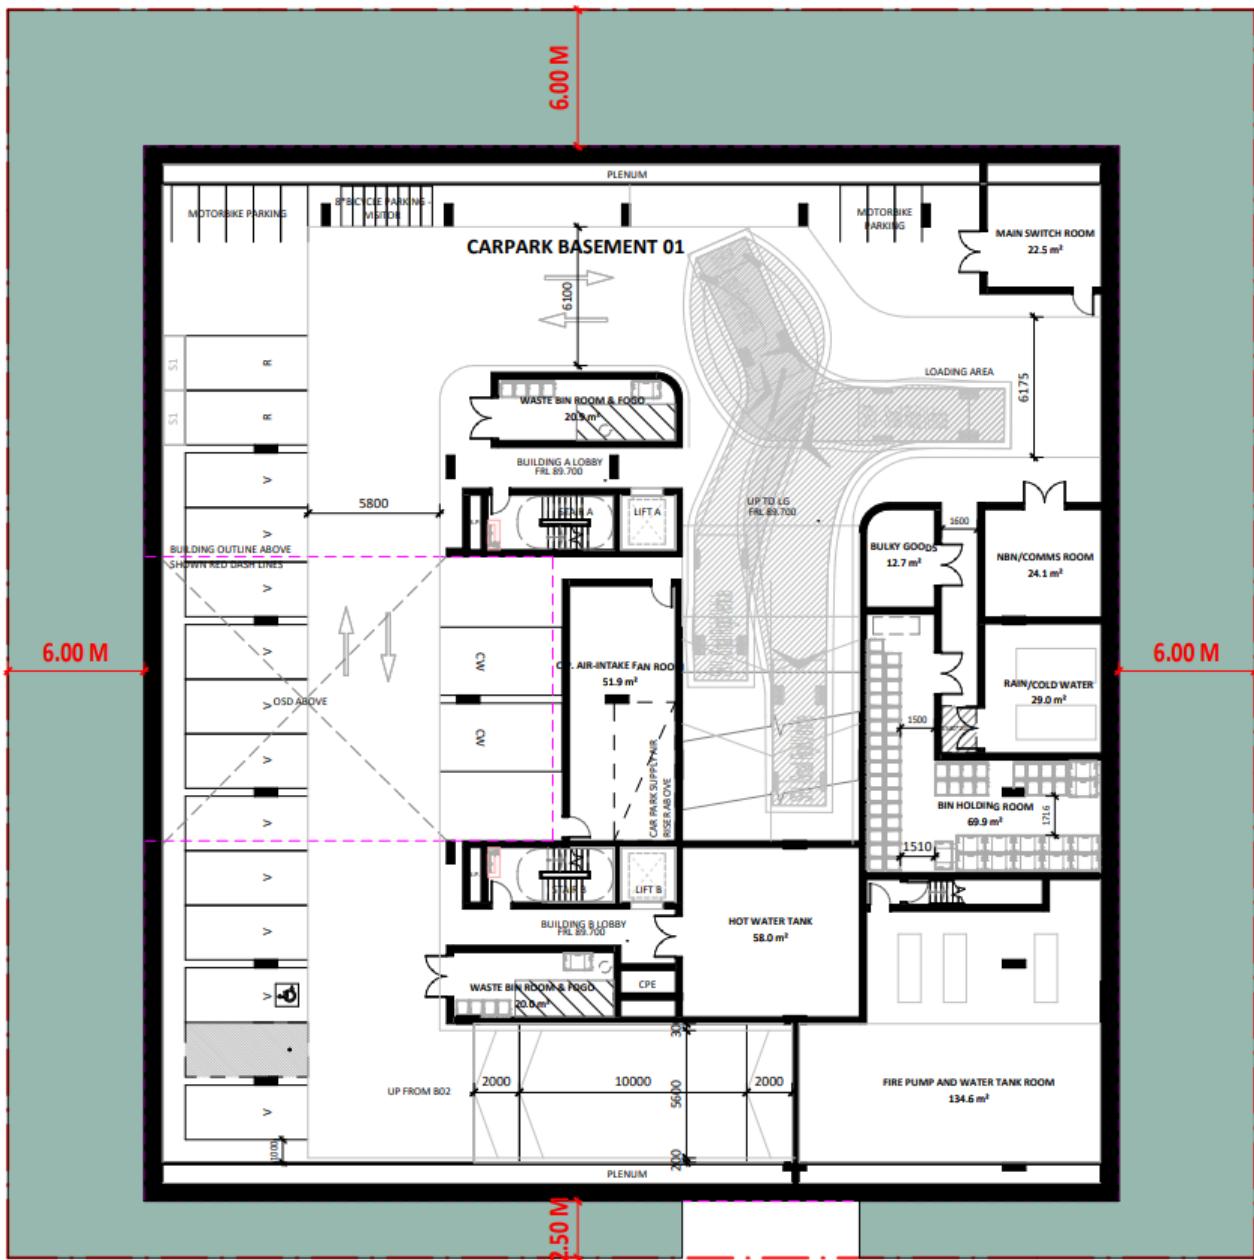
Proposed basement plan showing setbacks (Source: PTW)
